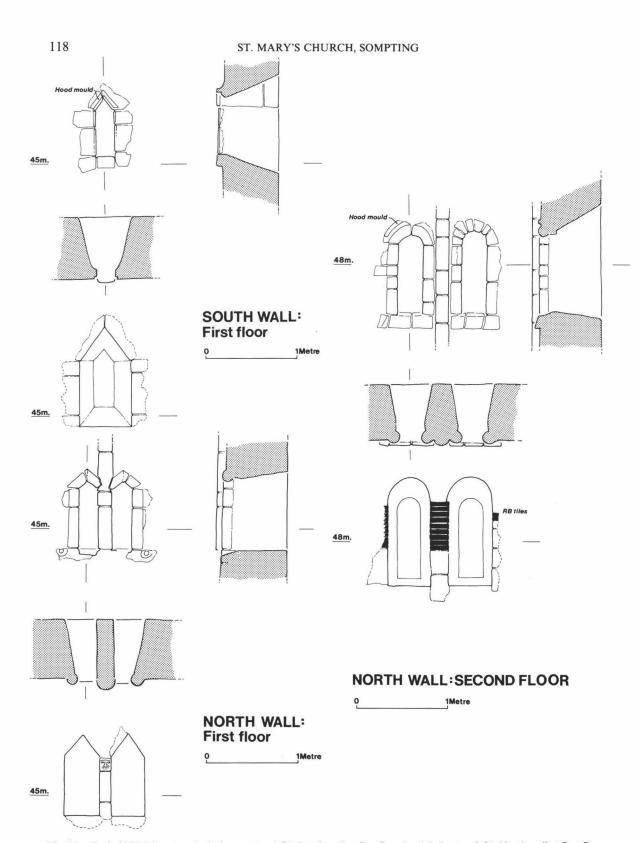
Period II (11th century) windows. a (top left). South wall at first floor level. b (bottom left). North wall at first floor level. c (right). North wall at second floor level.
